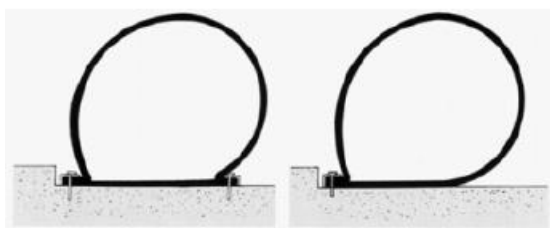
Left: two-sided clamped rubber sheet, Right: one-sided clamped rubber sheet.
